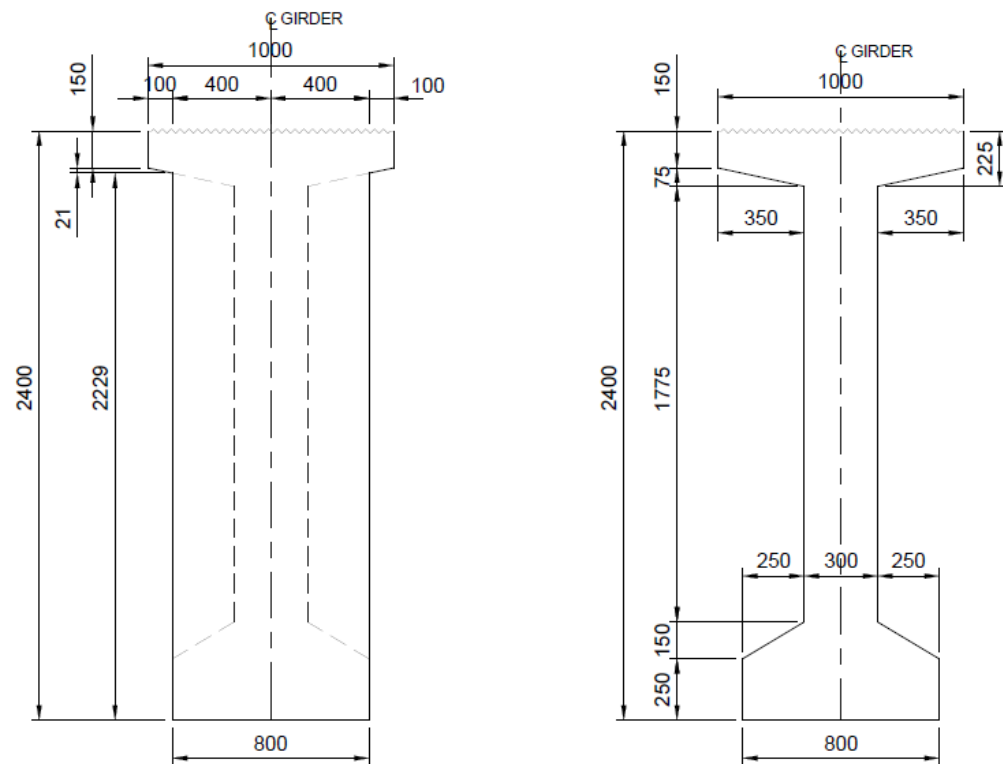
16 Girder section of 40m span OC post tensioned I girder at support and mid span
